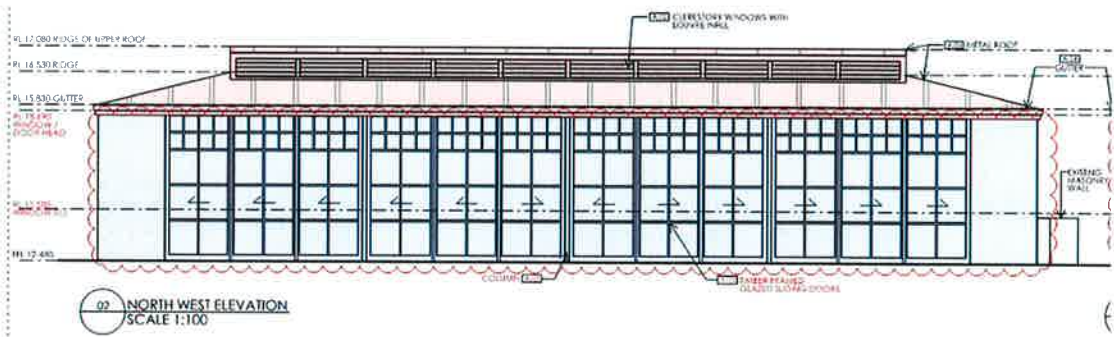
Proposed North West Elevation (Source: Akin Creative).
